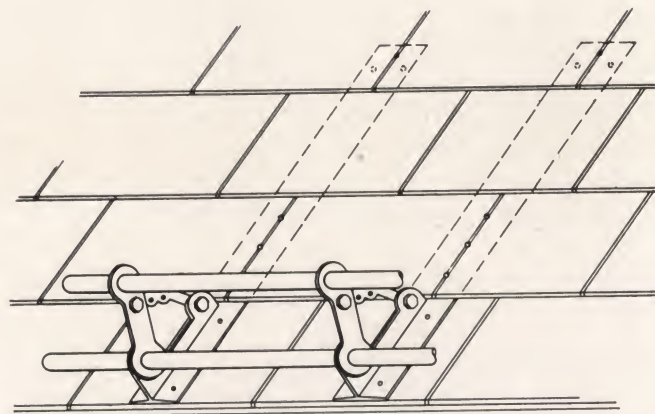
ADJUSTABLE BRACKET AND PIPE SNOW GUARD
